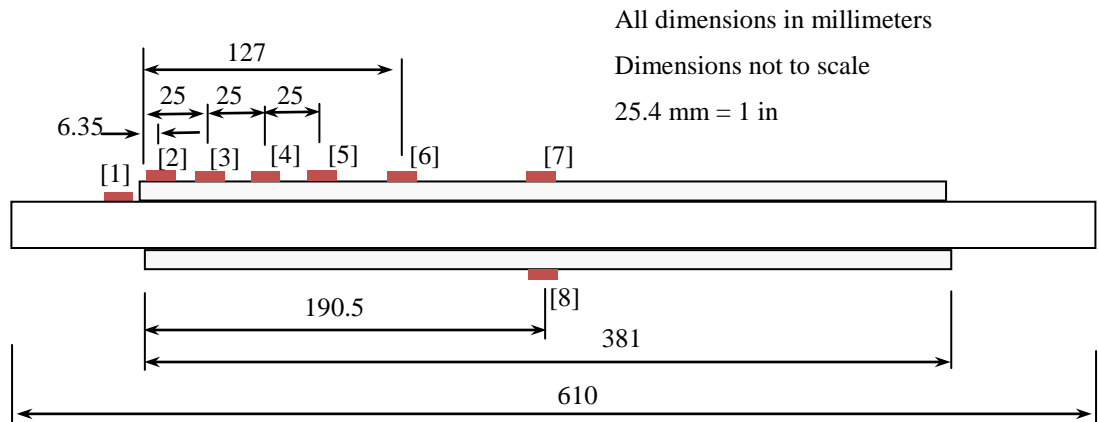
Doubly Reinforced Steel Plate Specimen Gage Layout
